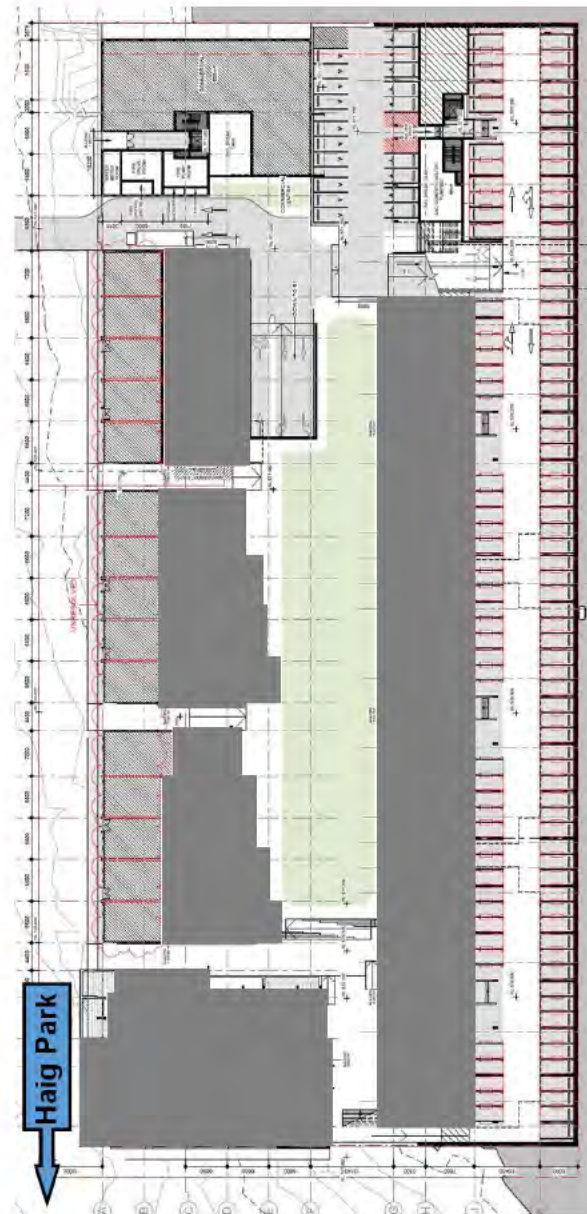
DA-21-03 Ground floor plan and the southern boundary with Haig Park to the left.
